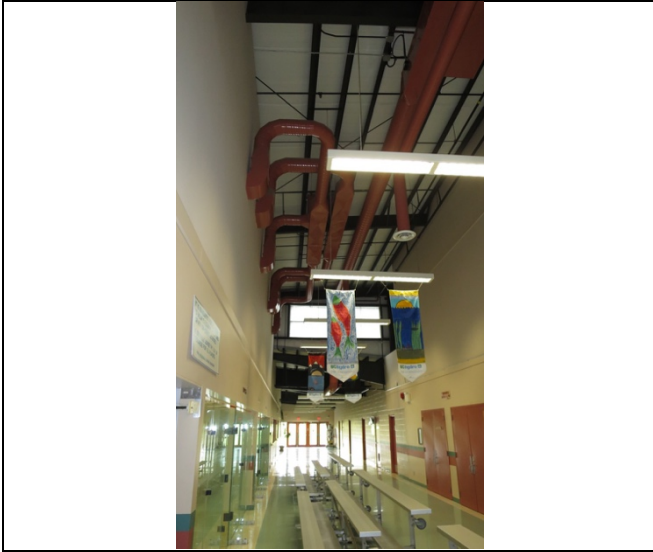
C3033 Painted Ductwork & Ceiling Purlins
